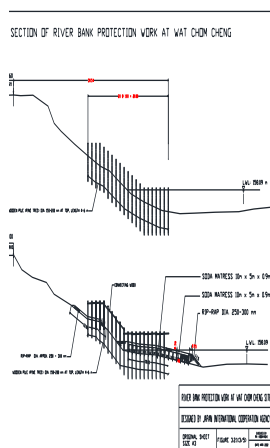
Wooden Pile Dike Groyne Work as a Candidate Riverbank Protection Works at Navanhnoy Site in Oudomxay Province (Adopted for Wat Chom Cheng Site in Vientiane Capital)
